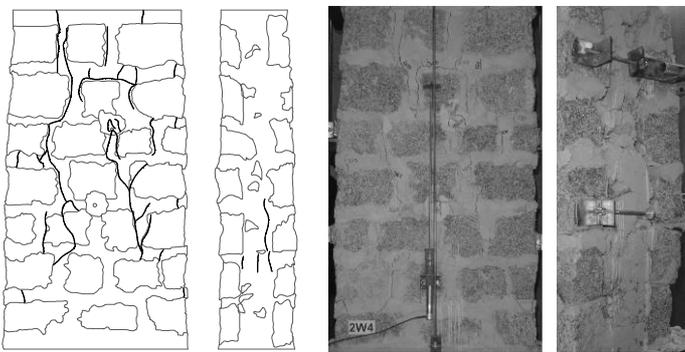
Typical crack pattern of a tied wall (wall 2W4).
